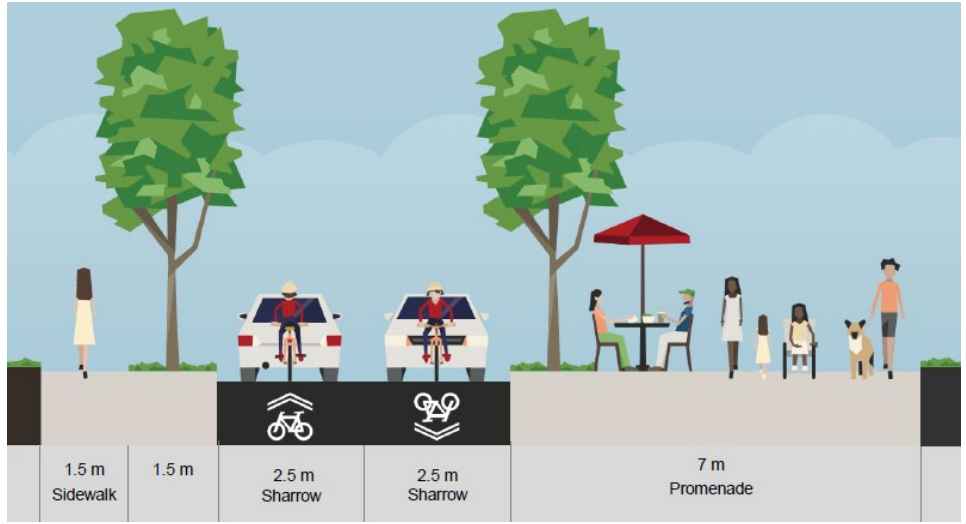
STREET DESIGN CONCEPT #2 – BIKE BOULEVARD
